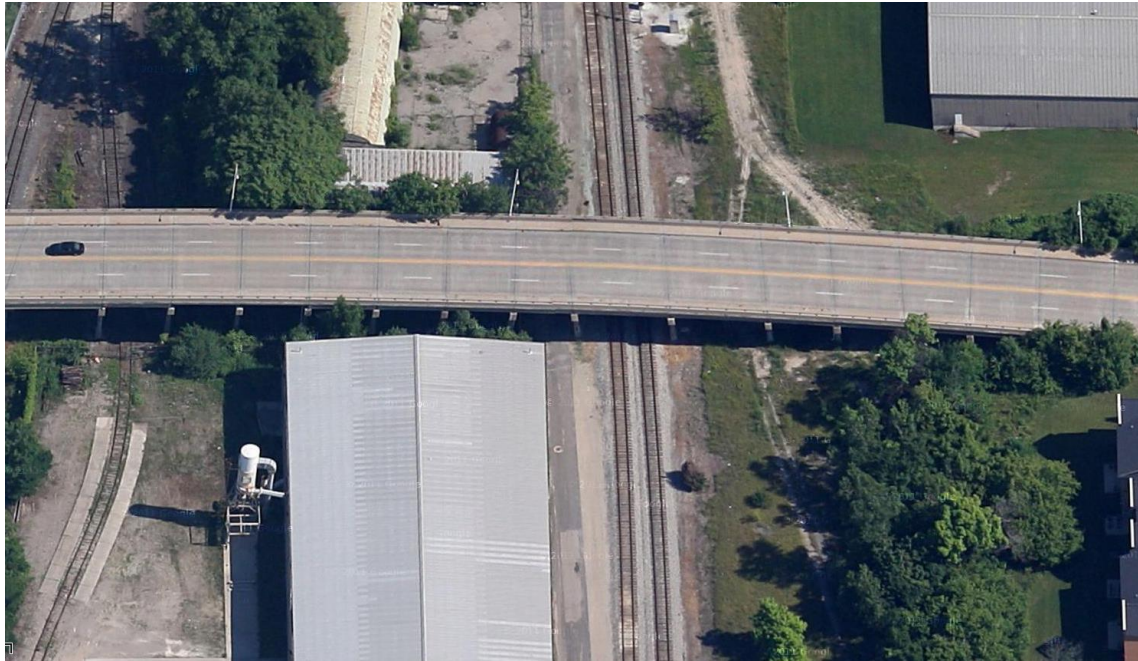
East Side of Franklin Street Bridge with Land Access to Underside.
